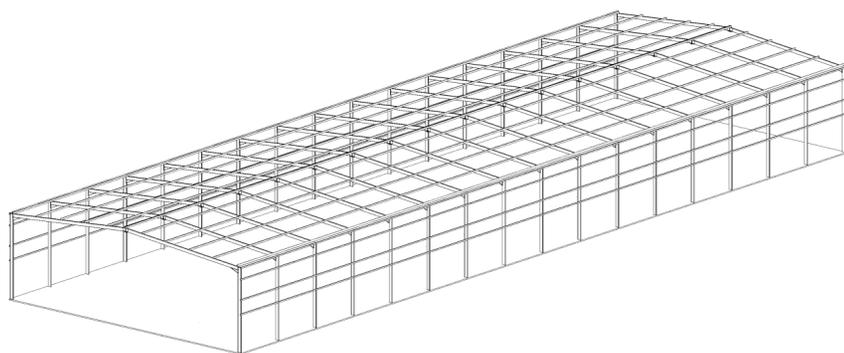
PROPOSED BUILDINGS STEEL PORTAL FRAME (FINISHES REMOVED)
